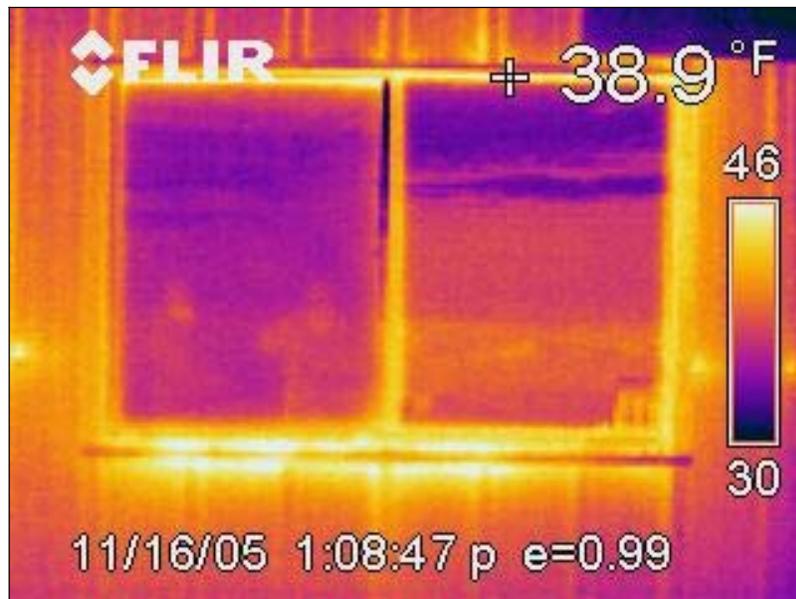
(IR0009) Window to the North of the door in the ESSH Building.
